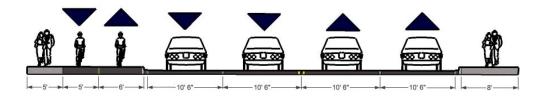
A: Southampton Street Selected Design Cross Section at Railroad Crossing
